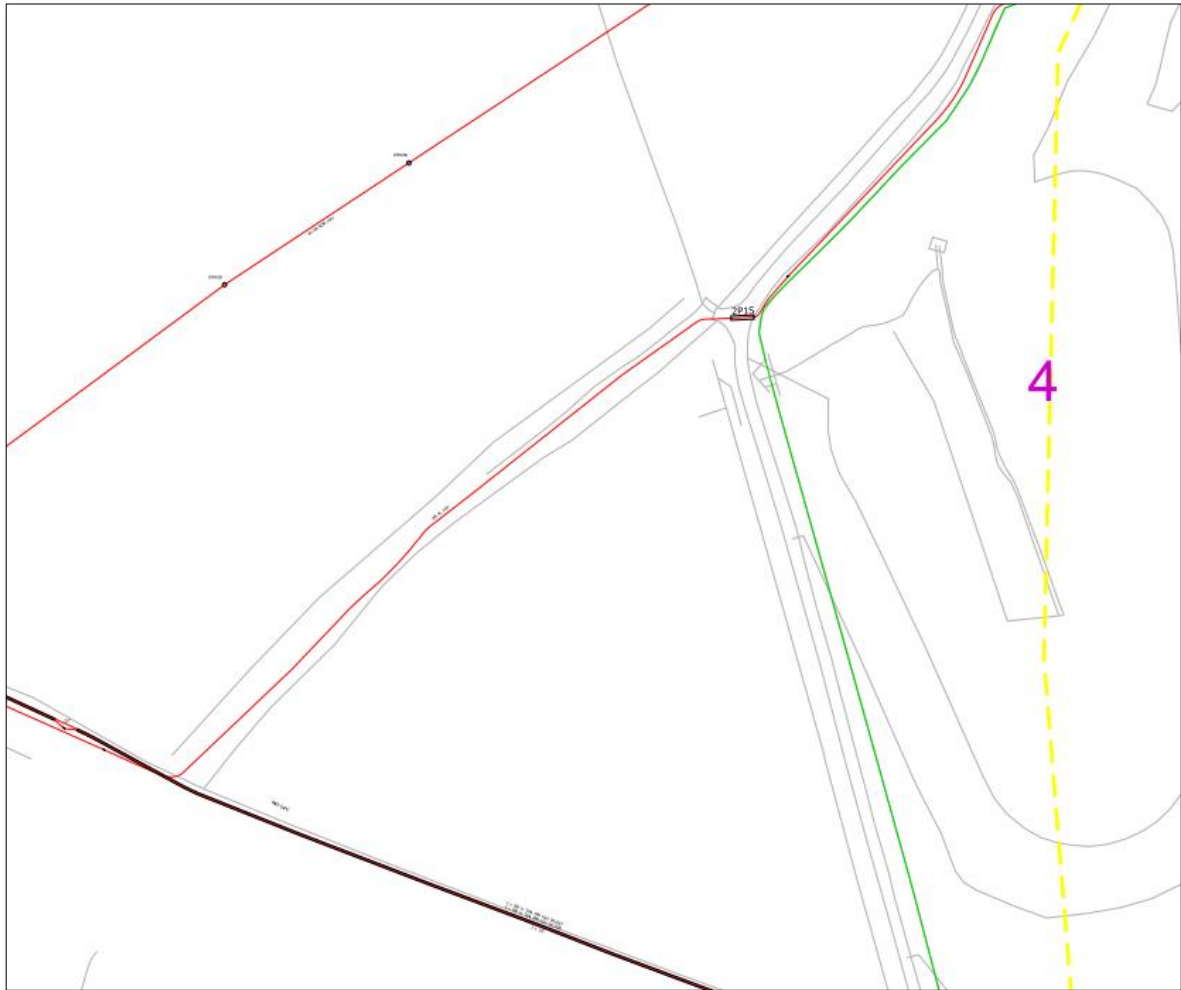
Existing underground 11kV (HV) cables running along the existing public footpath
